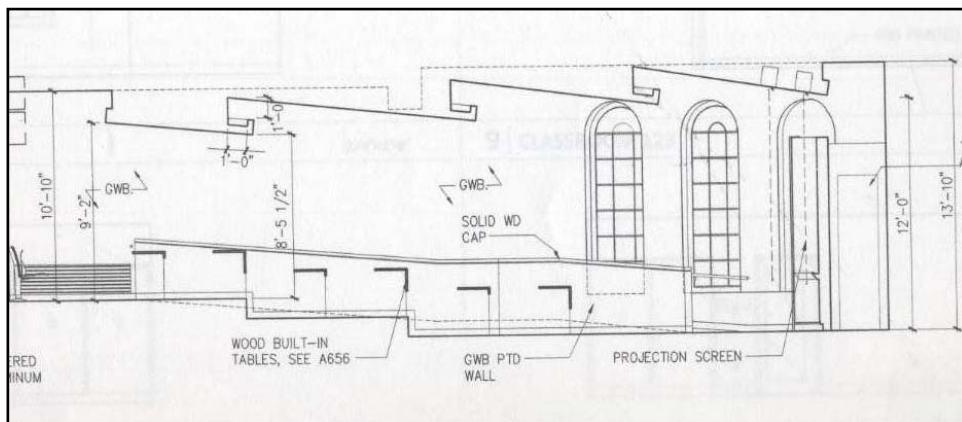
Section of Lecture Hall – Original Cove Ceiling
